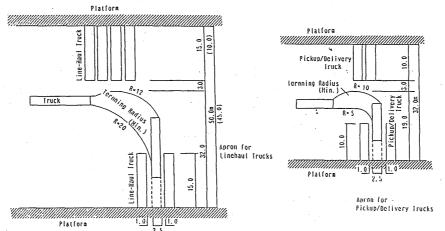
General Dimensions of Truck Berth and Spacing between Platforms
